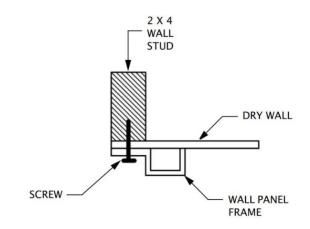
DETAIL OF WALL PANEL FRAME INSTALLATION
